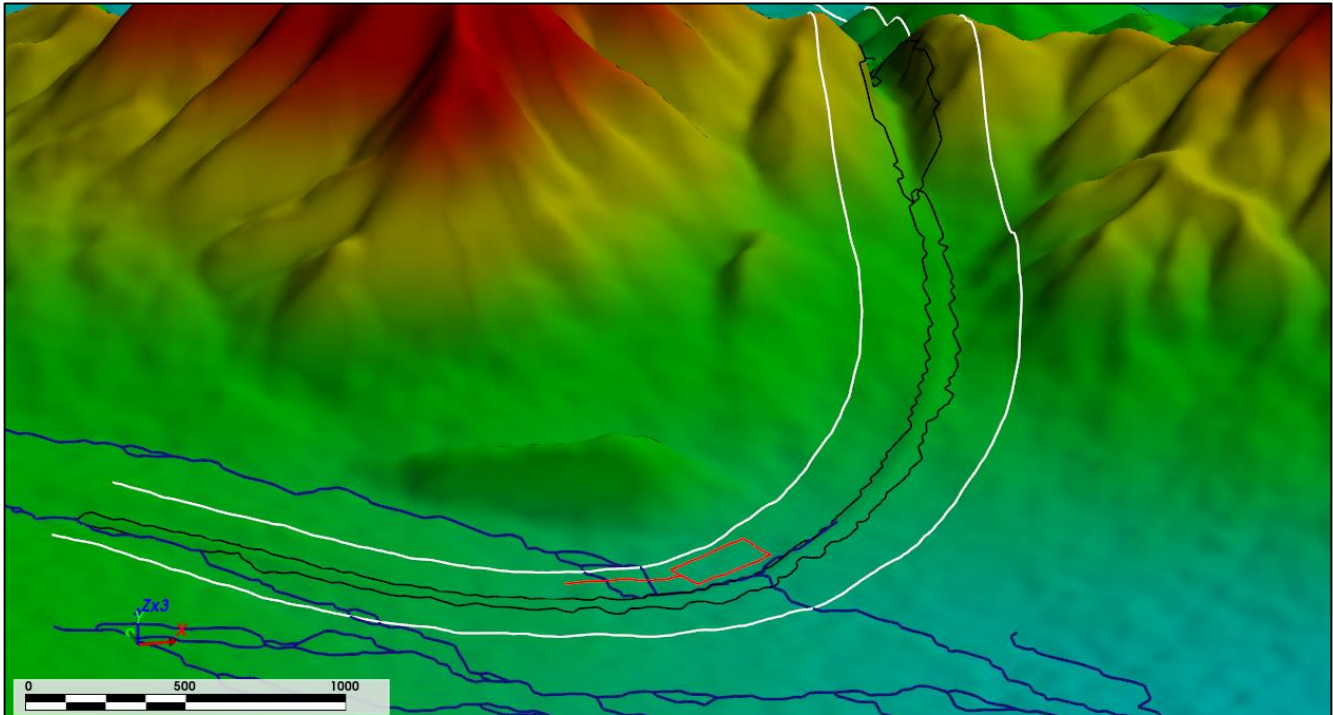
Ditch/sump layout, ROW and road footprint overlaid over HSV topography
